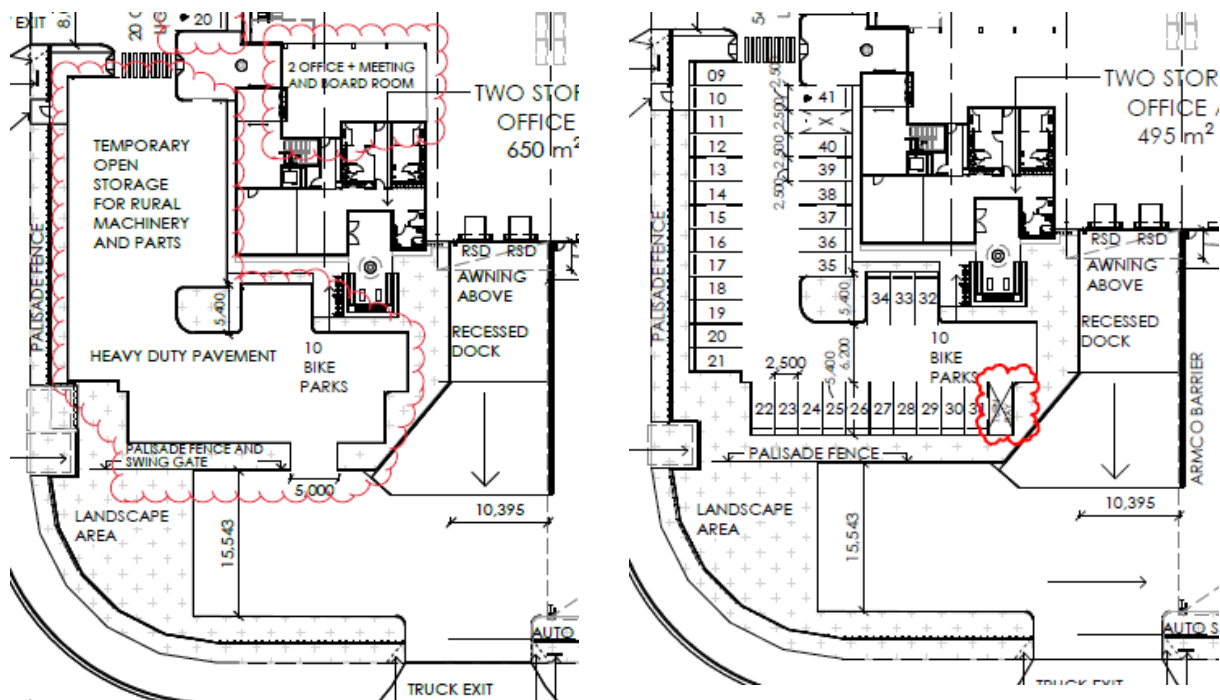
Proposed heavy duty pavement (left) replacing approved car parking (right) (Source: Gassman Development Perspective)
